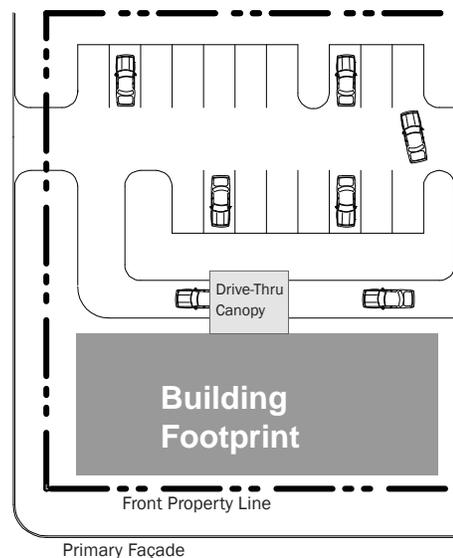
(8). Recommended Drive-Through Facility Layout.
